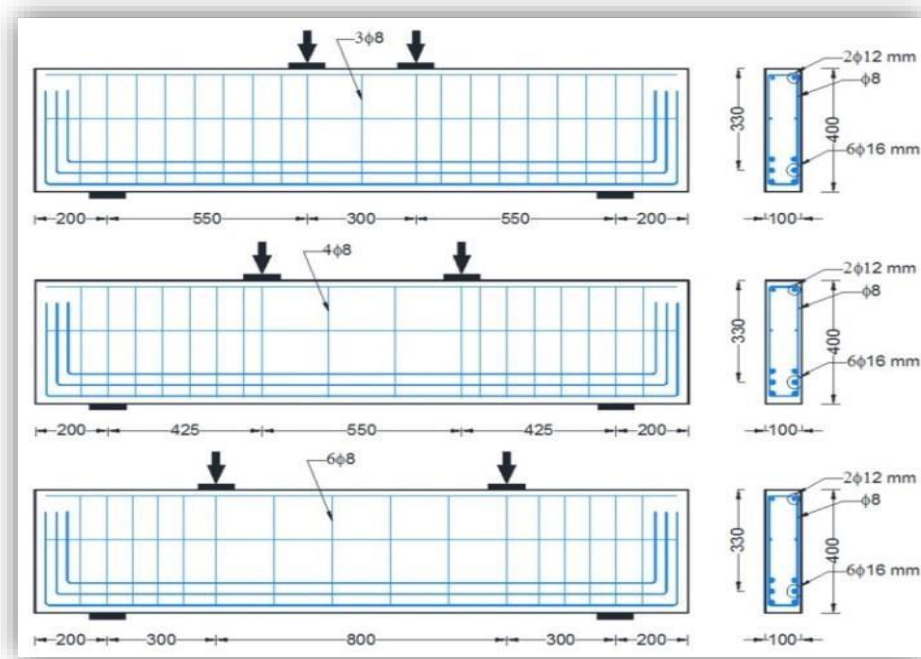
Details of the deep beams in the first group (Ismail, 2016)
